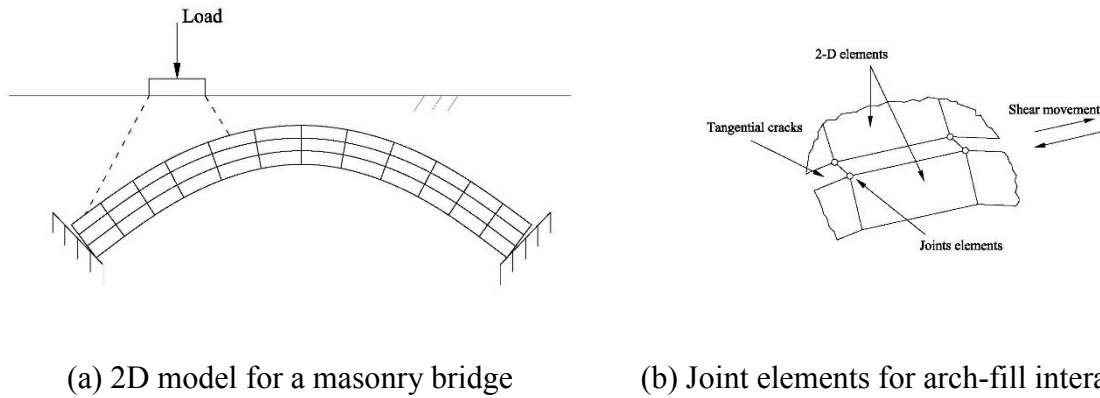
2D FE modelling approach for masonry bridges (Choo, Coutie & Gong, 1990b)
